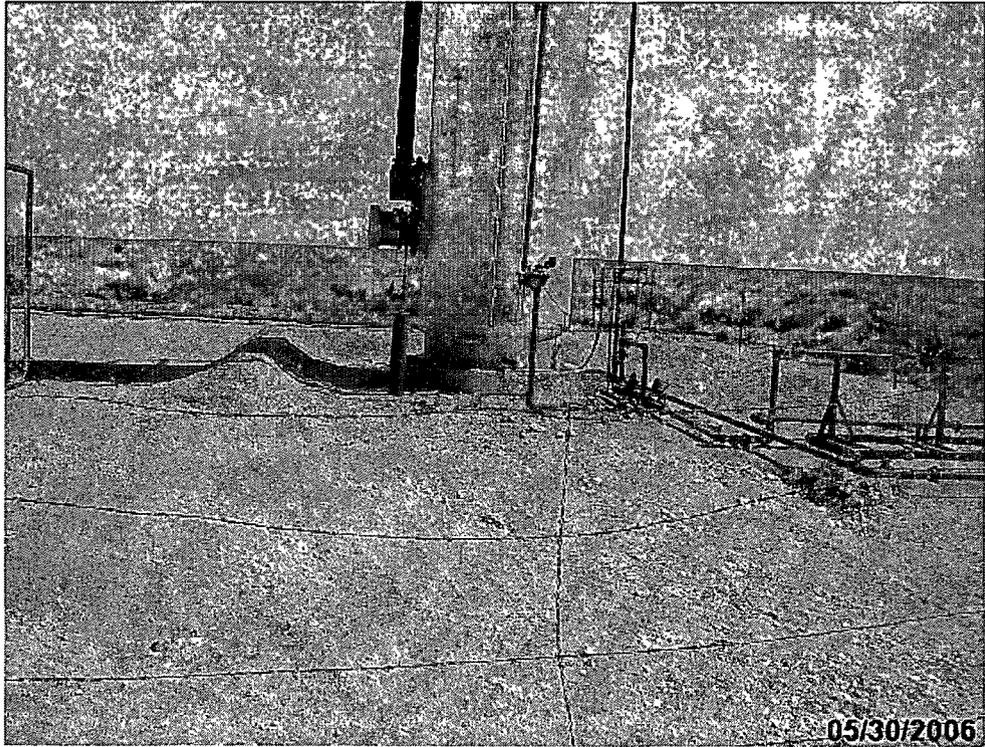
Looking southeasterly across excavation area one (1).
